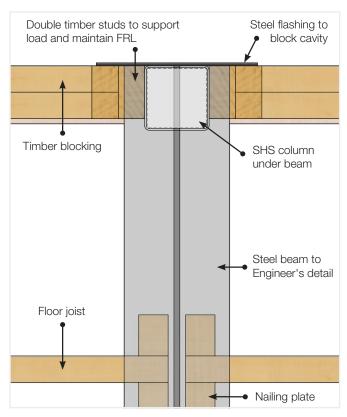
STEEL BEAM AND COLUMN PERPENDICULAR TO FIRE WALL - PLAN VIEW SHOWING ONE WALL LEAF
